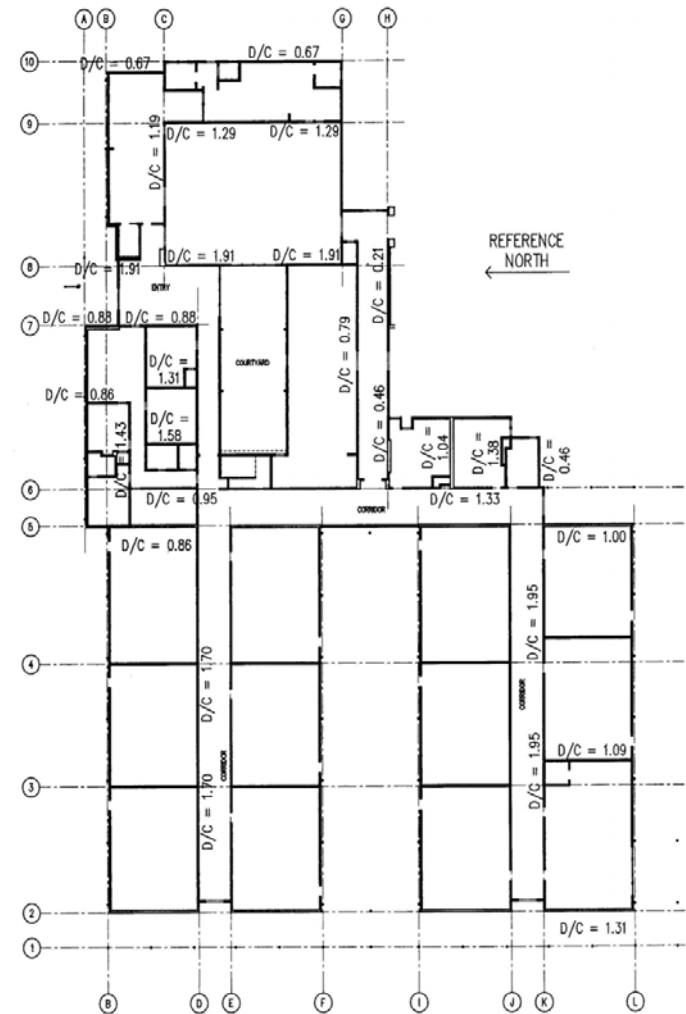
Floor plan of Building A. Demand to capacity (D/C) ratios for the principal shear walls and the rod bracing are also shown.
